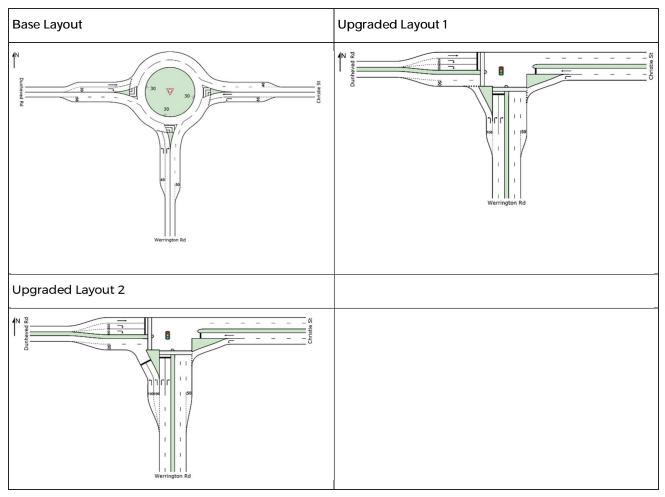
2026 with Links Road extension - Christie Street/Dunheved Road/Werrington Road
